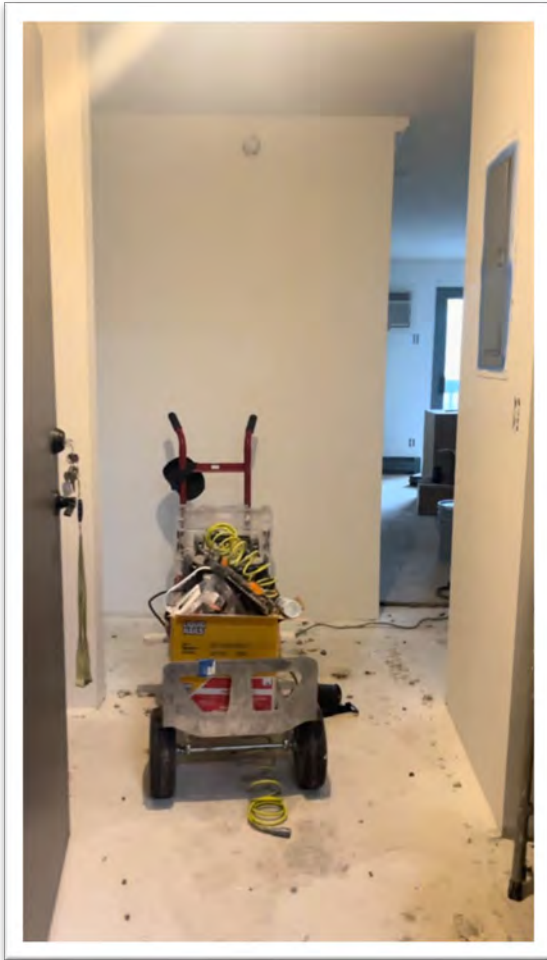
12" Yellow Floor Tile and Mastic in Damaged Condition in the 2<sup>nd</sup> Floor East Employee Room.
